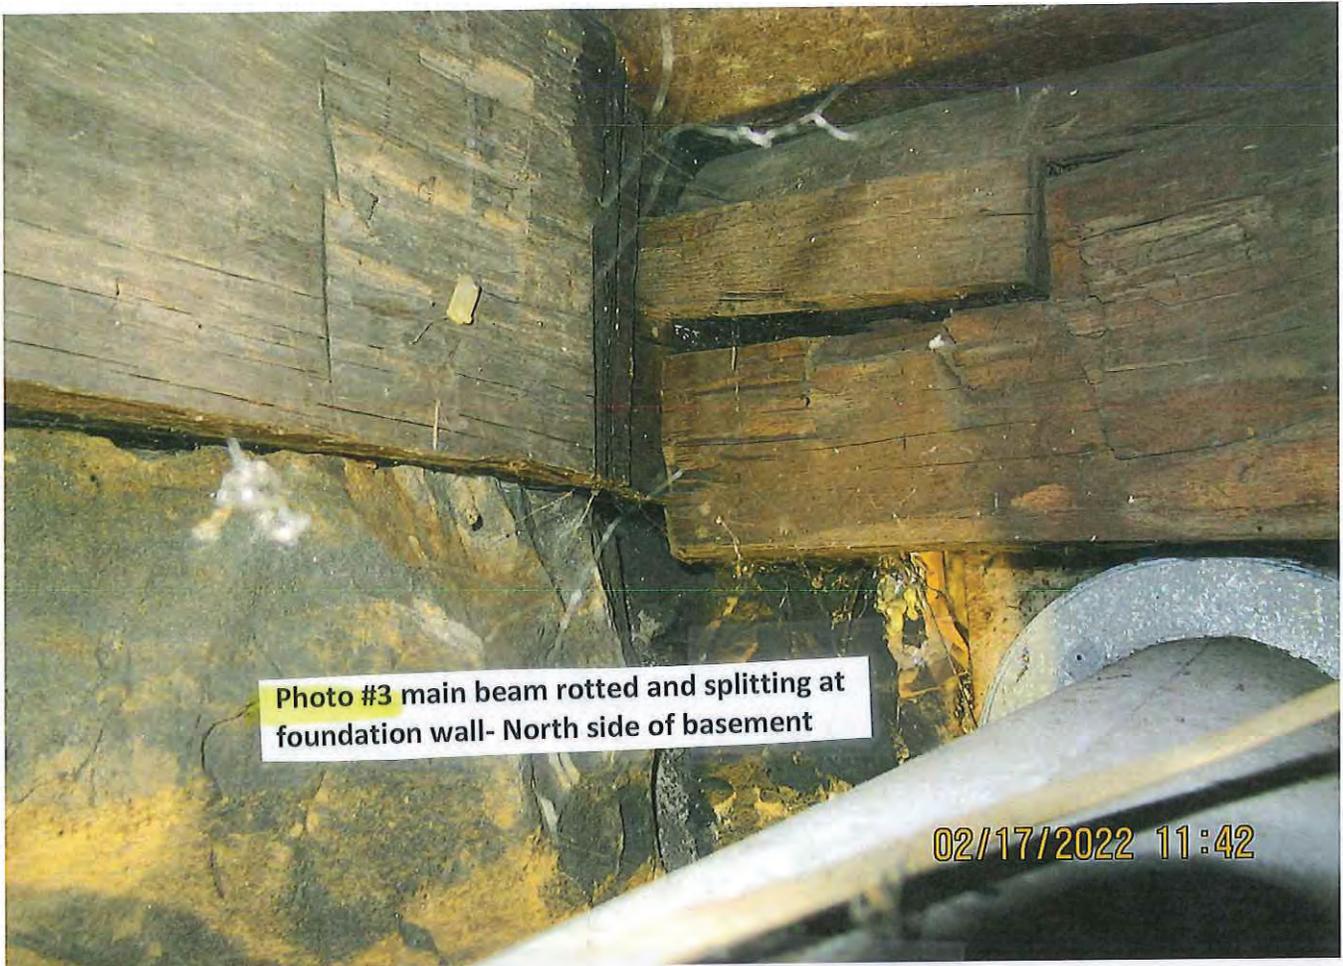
main beam rotted and splitting at foundation wall- North side of basement
